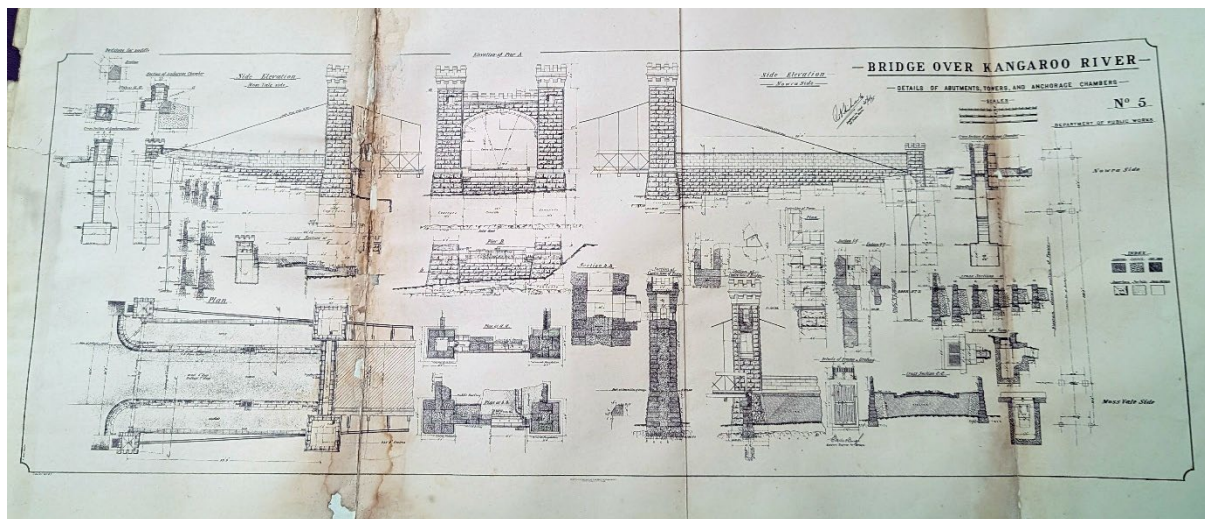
Details of Abutments, Towers and Anchorage Chambers, 1895 (Mitchell Library, Q624.23/1 – Sheet No. 5) Towers 42 ft high, 8 ft square at base, battered 1:20, parabolic relieving arch, drainage tunnels – the arch whose keystone Miss F. Comer laid on 6 June 1896.
